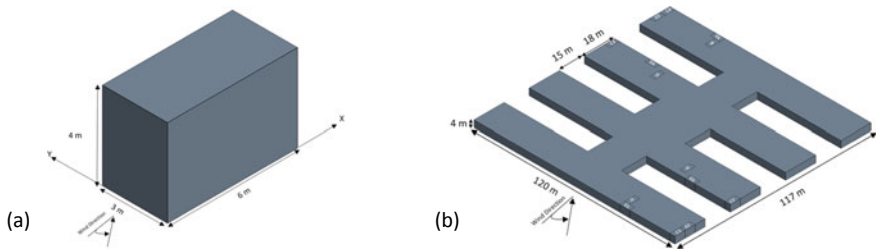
a Full-scale geometric details of a single module, b full-scale geometric details of multi-modules building
